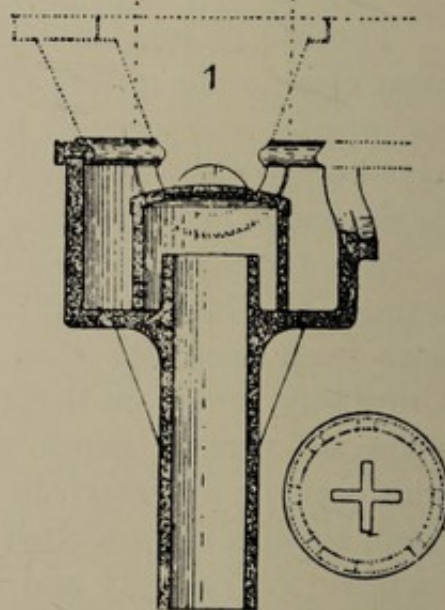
Plan and Section of Settling Pots Used in the Chemical Institute, Berlin.
